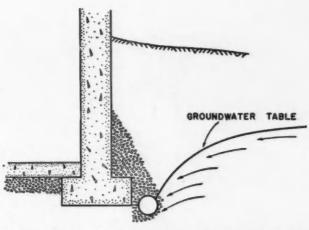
Whenever investigation reveals that the groundwater is likely to be at a higher level than the floor of a building or basement, drainage pipes should be installed close to the foundation walls to carry excess water away. Similar precautions should be taken in connection with excavations.
